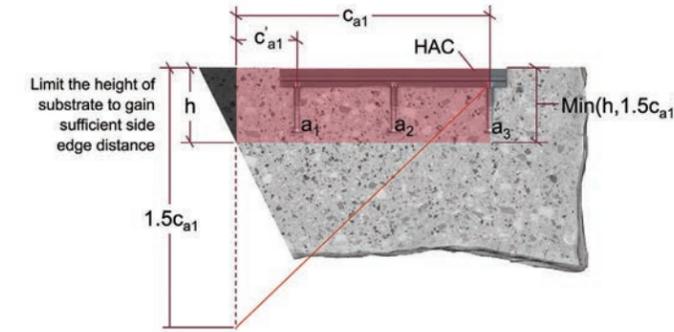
Acute corner — Longitudinal shear — Section view.
